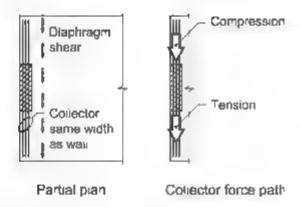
Collector having same width as shear wall, forces are reversible
